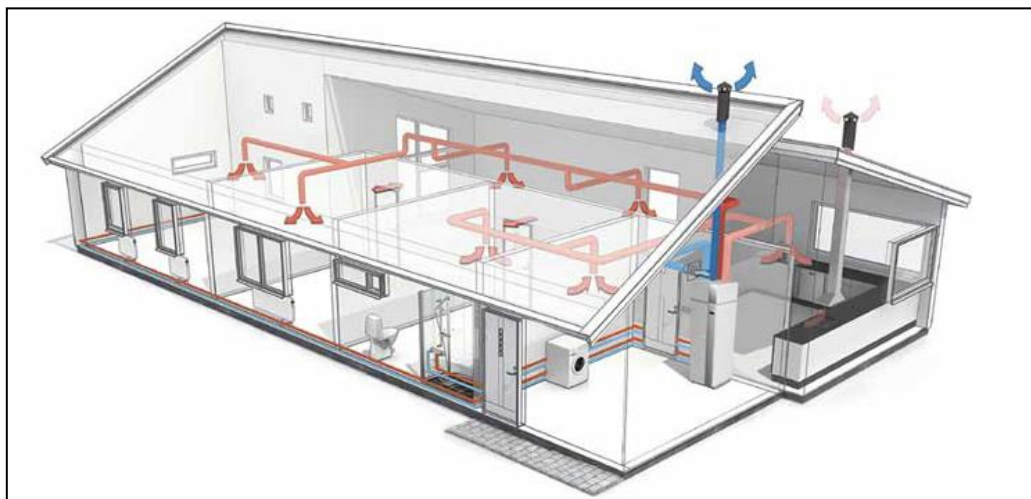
Example Diagram of Typical Exhaust Air Heat Pump Layout
